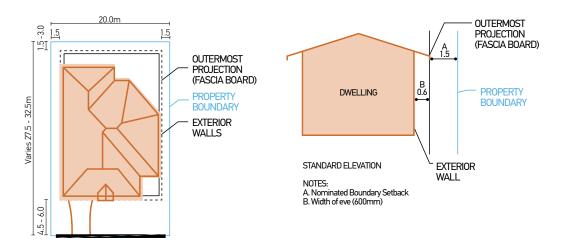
Premium Traditional Allotment - Typical Building Envelope and Setback Plan
